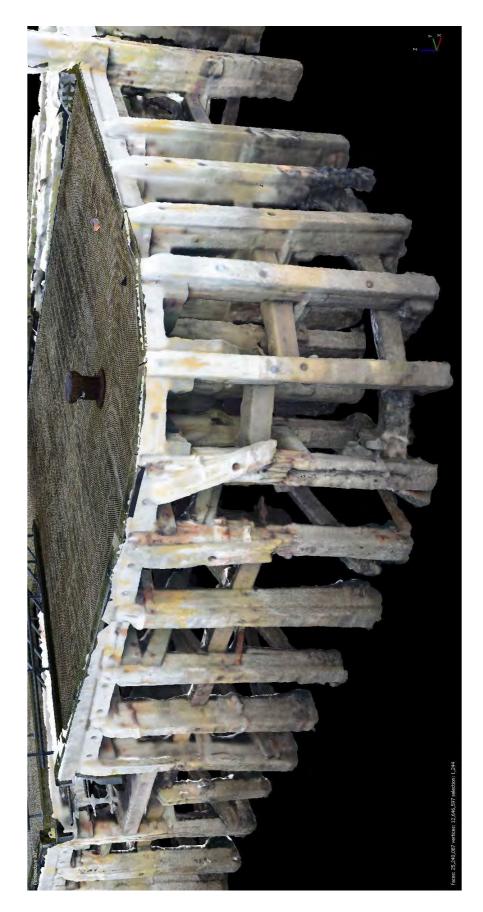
Helensburgh Pier – Screen grab of deck bollard damage
